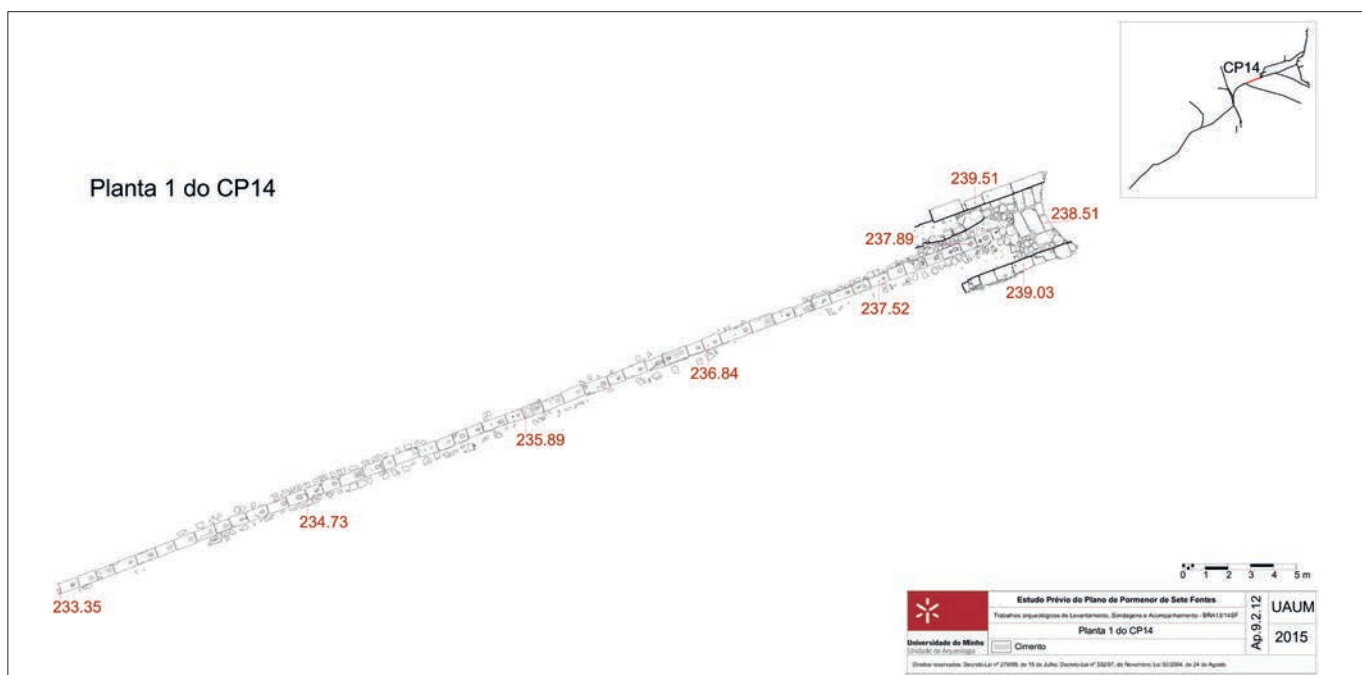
Survey drawing plan of the CP14 section of the main pipe. © UAUM
